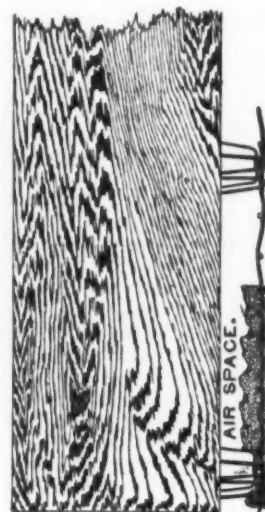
End View of Plastered Surface, Showing Air Space Between Lathing and Studding.
